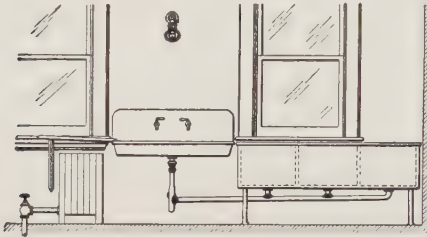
Elevation of outside kitchen wall, showing recommended position for trays, sink, etc.
